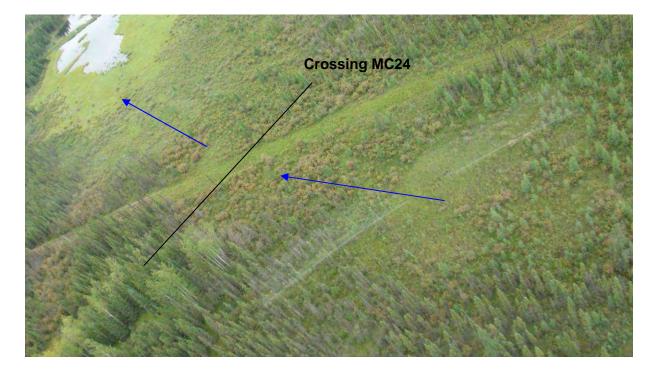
Drainage 16 looking south east at proposed crossing site MC24
